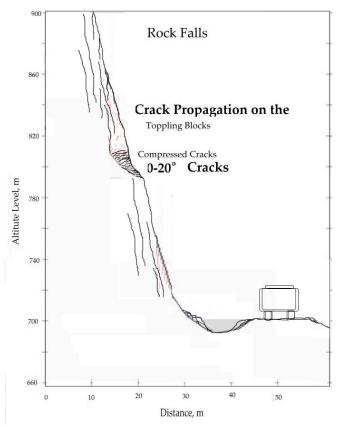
Toppling failure as rock falls over shale slope areas cross section of Şırnak Avgamasya Quarry No.1 south area and survey area 1/5000.
